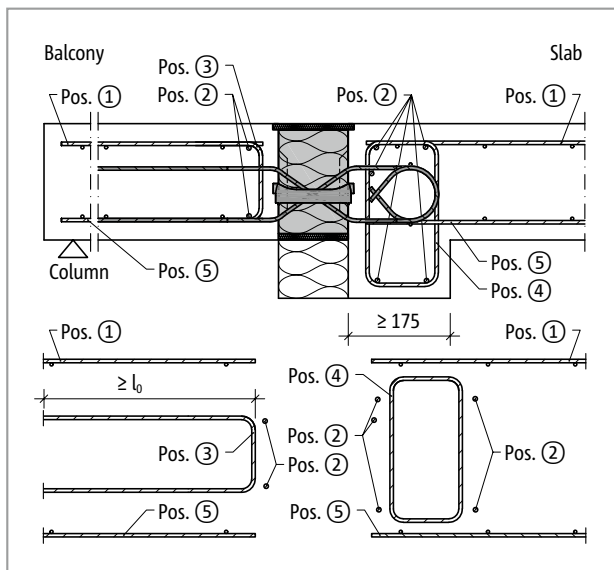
Schöck Isokorb® XT type Q-VV1 to VV4 on-site reinforcement in downstand beam
